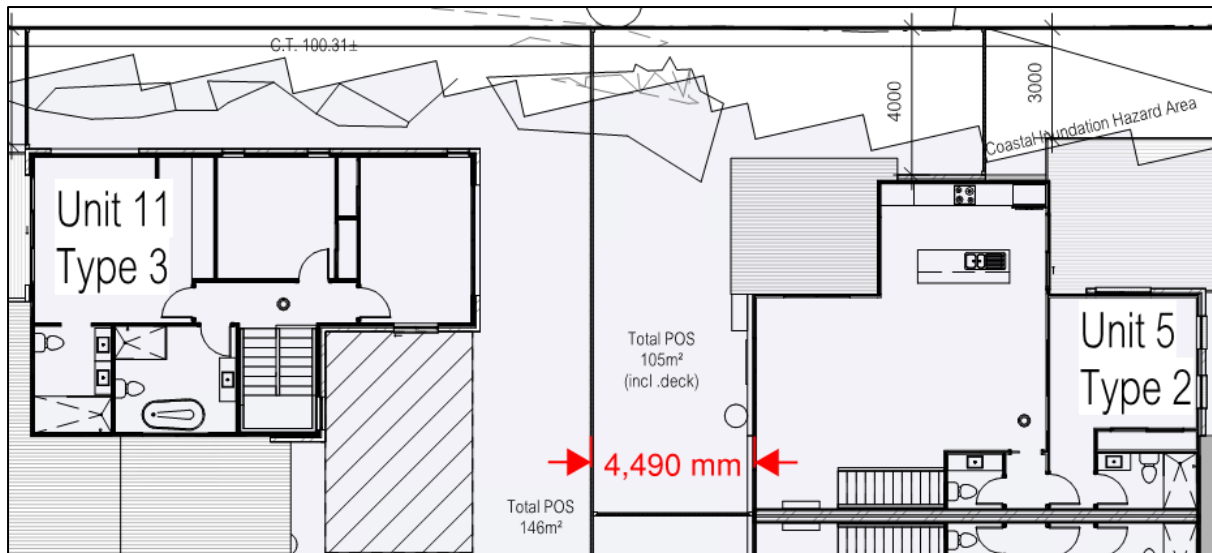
Section of site plan showing the minimum 4.5m setback of the living room window of Unit 5 to the private open space of Unit 11 (scaled measurement by author)
